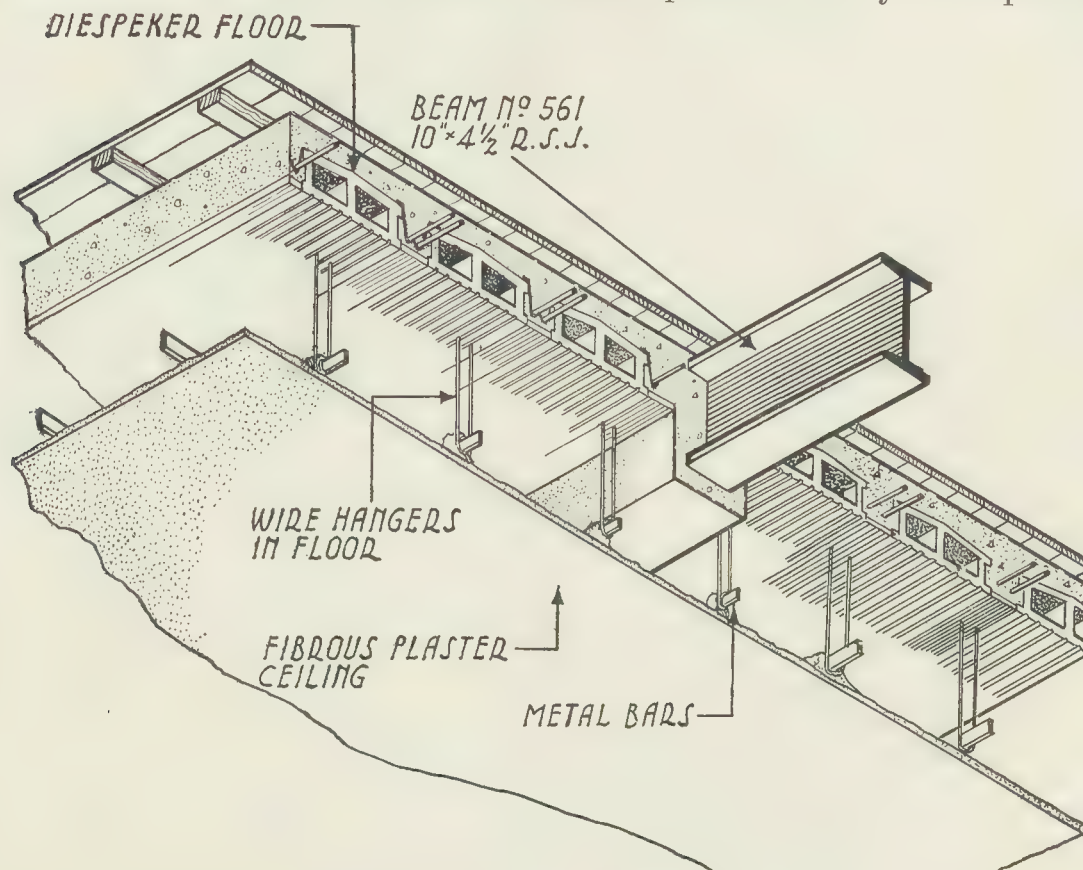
CONSTRUCTION OF SUSPENDED CEILINGS
